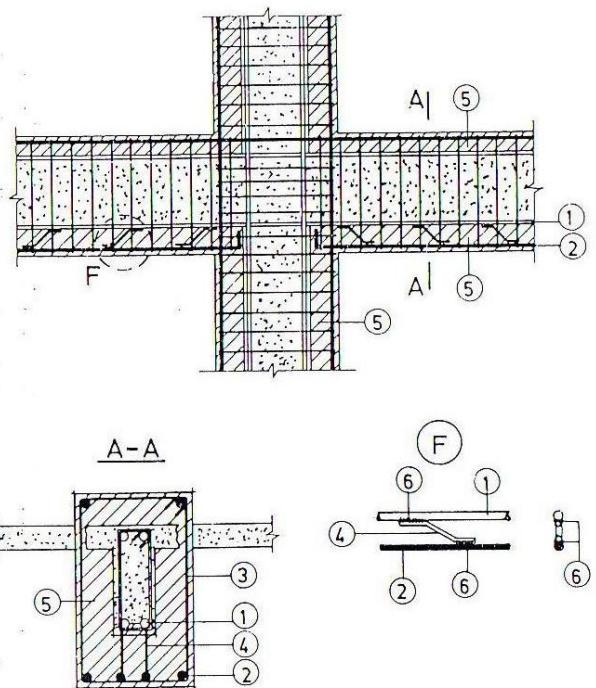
Jacket on four sides of a beam; 1-existing reinforcement, 2-added longitudinal reinforcement, 3-added stirrups, 4-welded connecting bar, 5-concrete jacket, 6-welding (P.Gavrilovic, [15])
